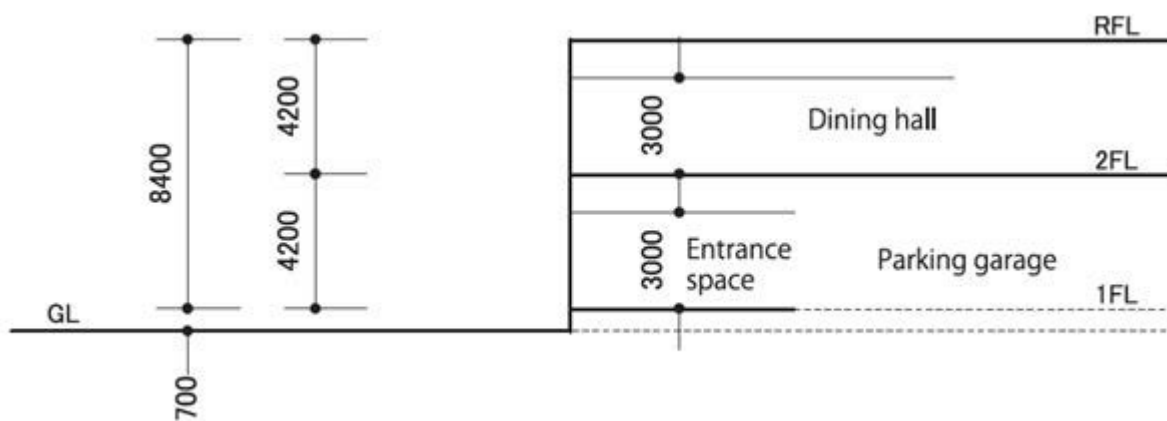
Model building (restaurant, 1 500 m²) section 1/300
